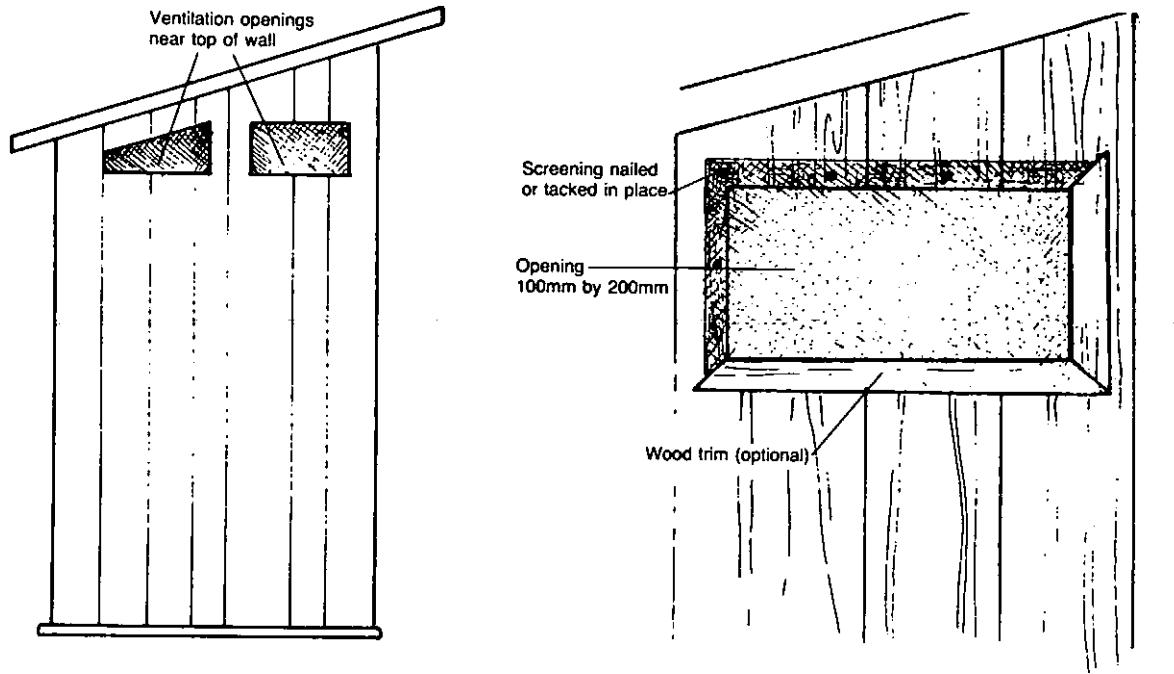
Fly-Proof Screening Covering Ventilation Openings
